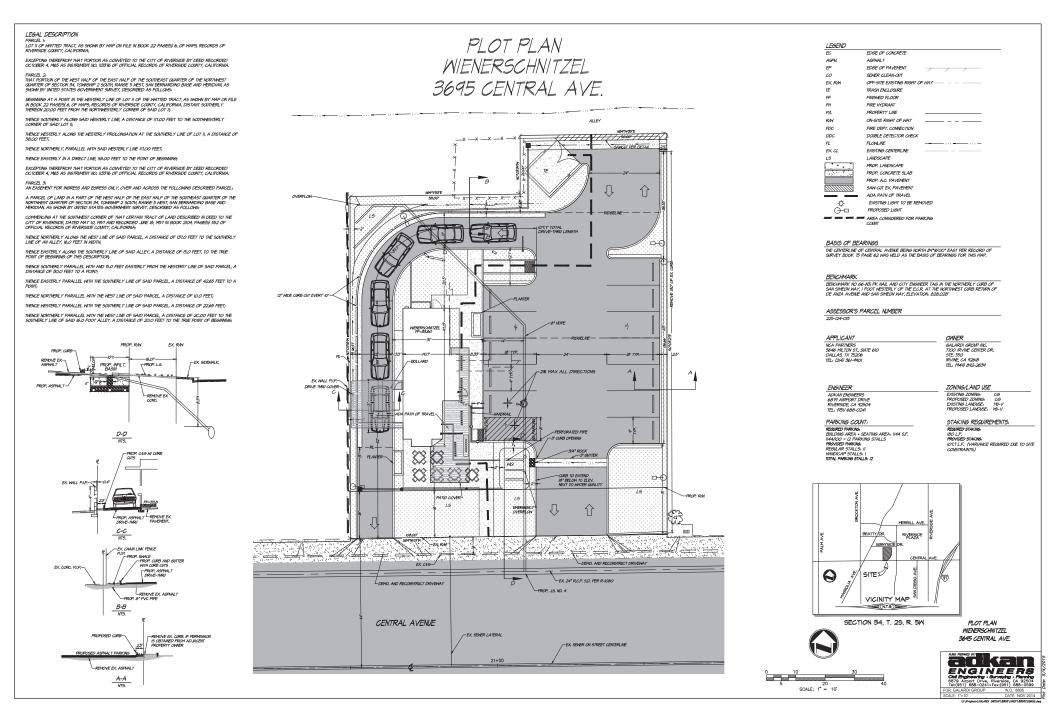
P15-0068, -0175, -0176, -0399, -0400, Site Plan
